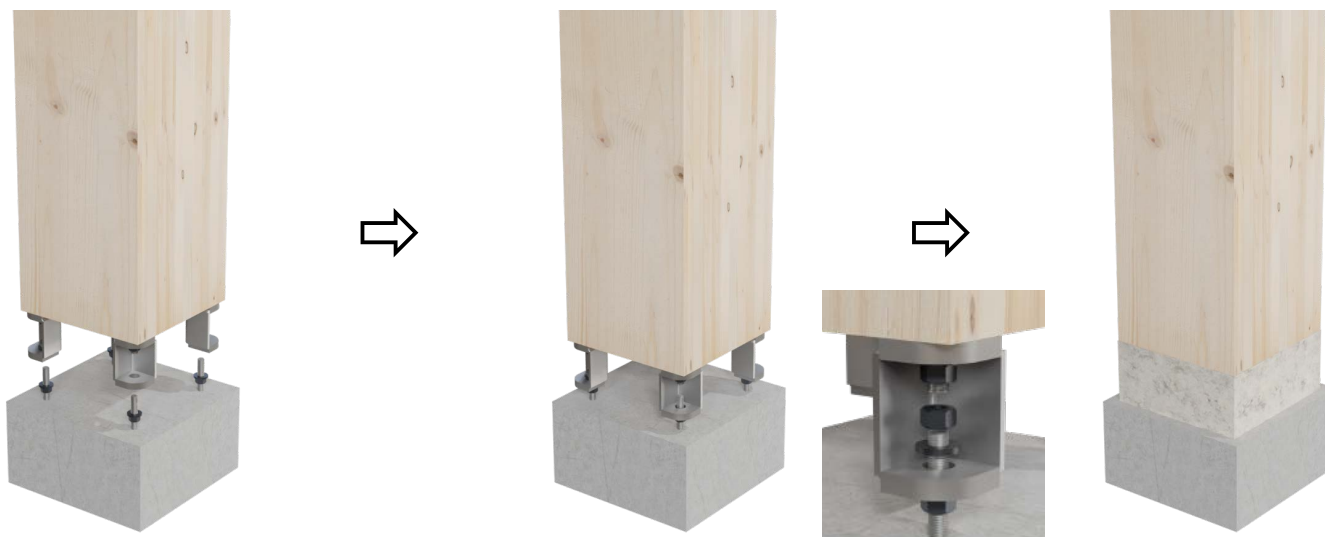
Installation of ROOCO® Column Shoes on foundation with vertical adjustment.
